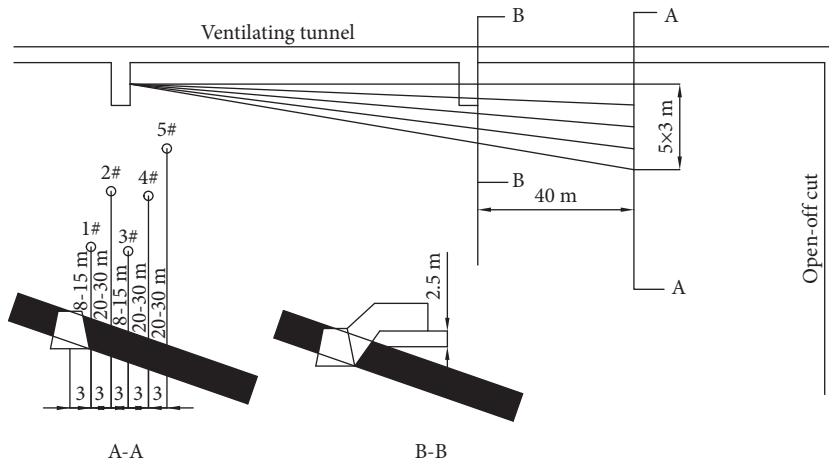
Roof borehole layout in No. 2 1024 panel.
